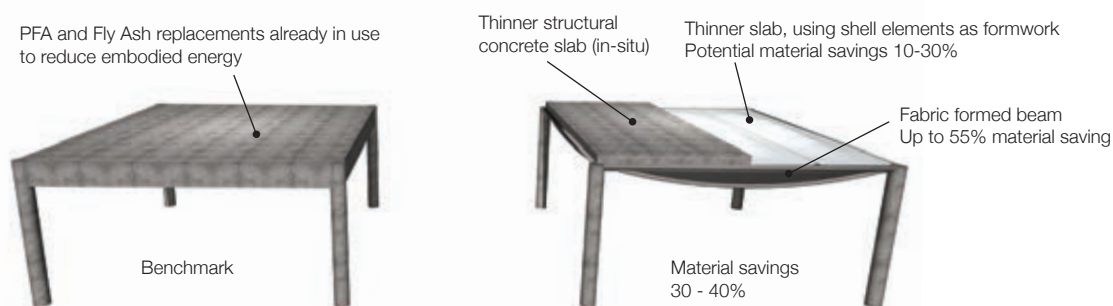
Future use of fabric cast shells as permanent formwork for in situ concrete construction.
